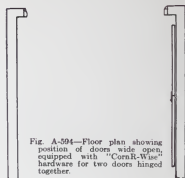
Floor plan showing position of doors wide open, equipped with "CornR-Wise" hardware for two doors hinged together.
